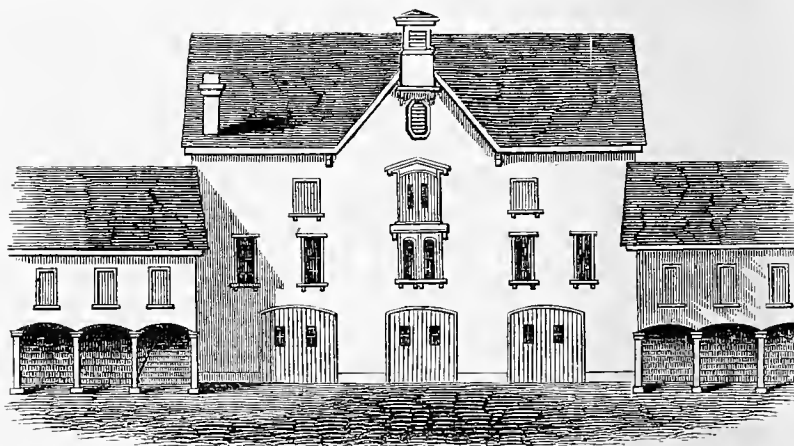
ELEVATION OF SOUTHERN SIDE.
